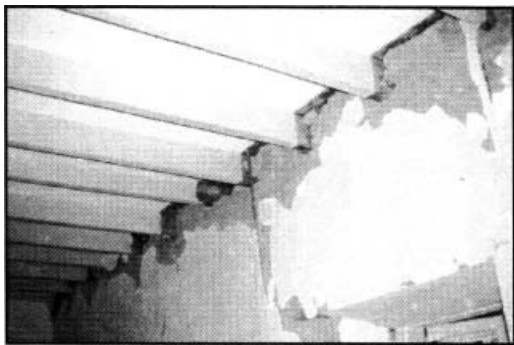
Damage at the interface between the ceiling joists and the adobe walls. This was typical throughout the structure.
